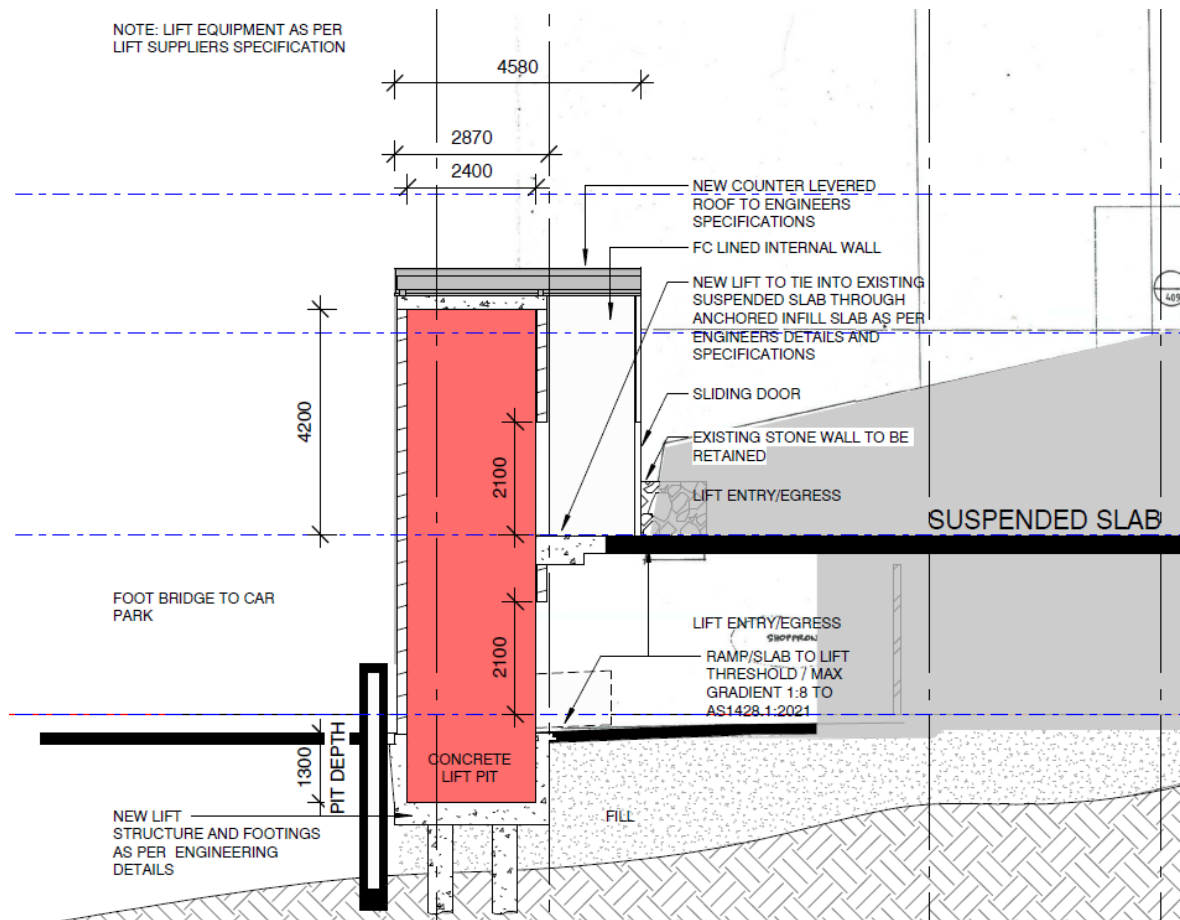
| Section Plan illustrating the cross-section of the proposed lift (Source: Applicant's documentation)
